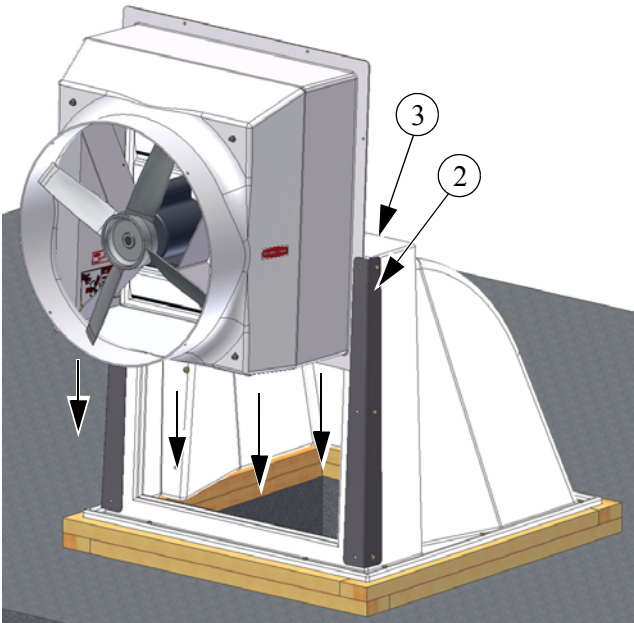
Fastening the Transition and sliding Fan Assembly into place
